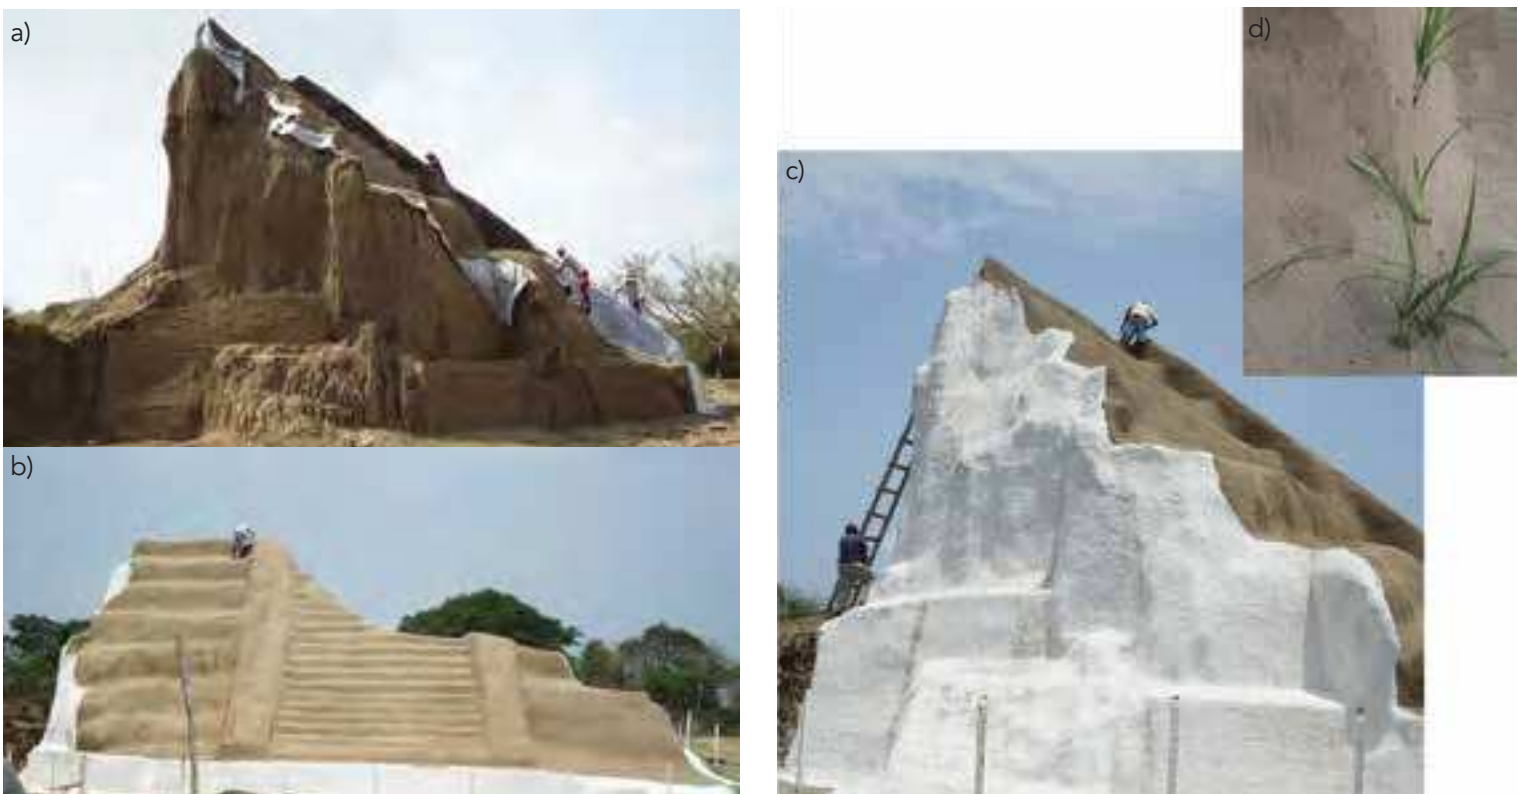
La Joya Pyramid in spring 2009: first preservation experiment: a) retaining walls at the foot of west façade and on the north profile, placing of geotextile and protective layer; b) west façade after preservation; c) north profile after preservation and d) weeds growing through geotextile and sacrificial layer (credits: Annick Daneels, from project authorized by the Archaeology Council of Mexico's National Institute of Anthropology and History)
